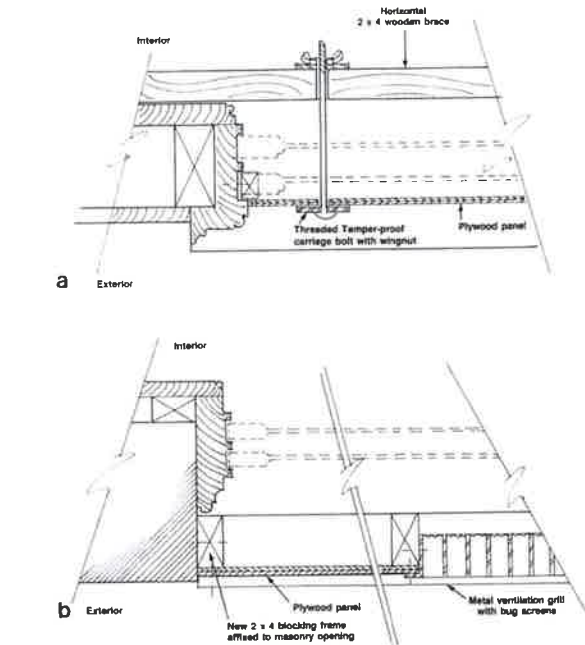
A: Plan detail showing plywood security panel anchored with carriage bolts through to the inside horizontal bracing, or strong backs. B: Plan detail showing section of plywood window panel attached to a new pressure treated wood frame set within the masonry opening. Ventilation should be included whenever possible or necessary.
